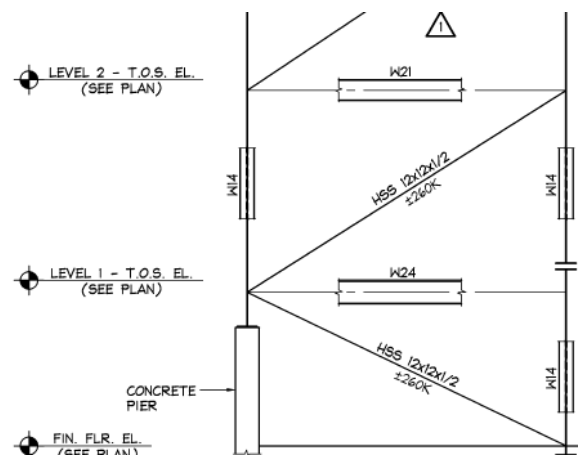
Typical Braced Frame, Courtesy of Turner Construction
